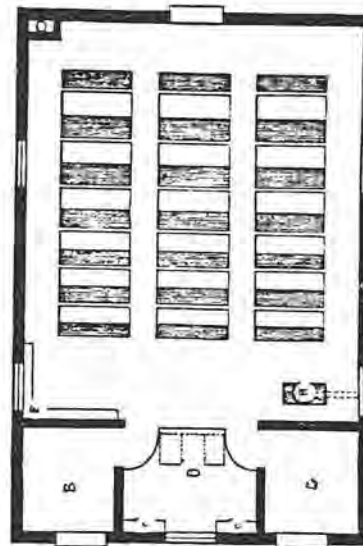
The floor plan of the Barnard school above features a large classroom and separate entrances for boys and girls (marked B and C). This straightforward plan was to be used for most one-room school designs throughout North America well into the 20th century. (*School Architecture in Rural Canada Before 1930*, p. 191)
